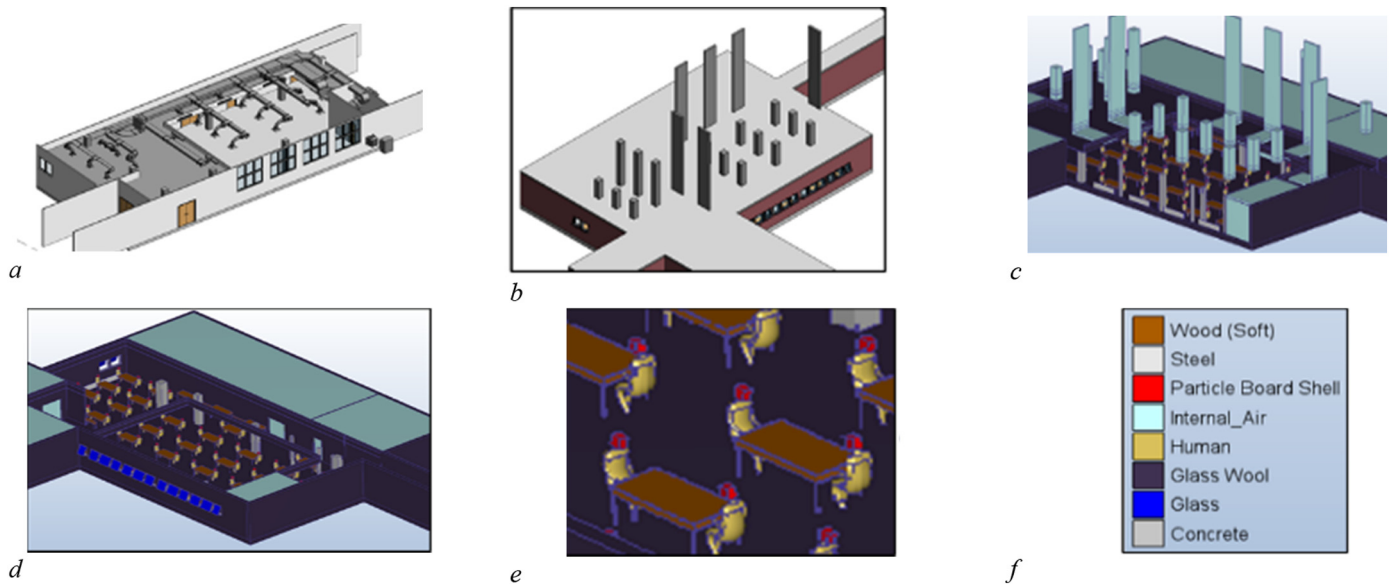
Autodesk Revit models; a) original with mechanical ventilation, columns and doors included b) simplified, showing extrusions at inlets and outlets and extended corridors. Autodesk CFD models seen from above; c) mixed ventilation scenario; d) natural ventilation scenario; e) close-up of occupants at tables; f) key to each material.
